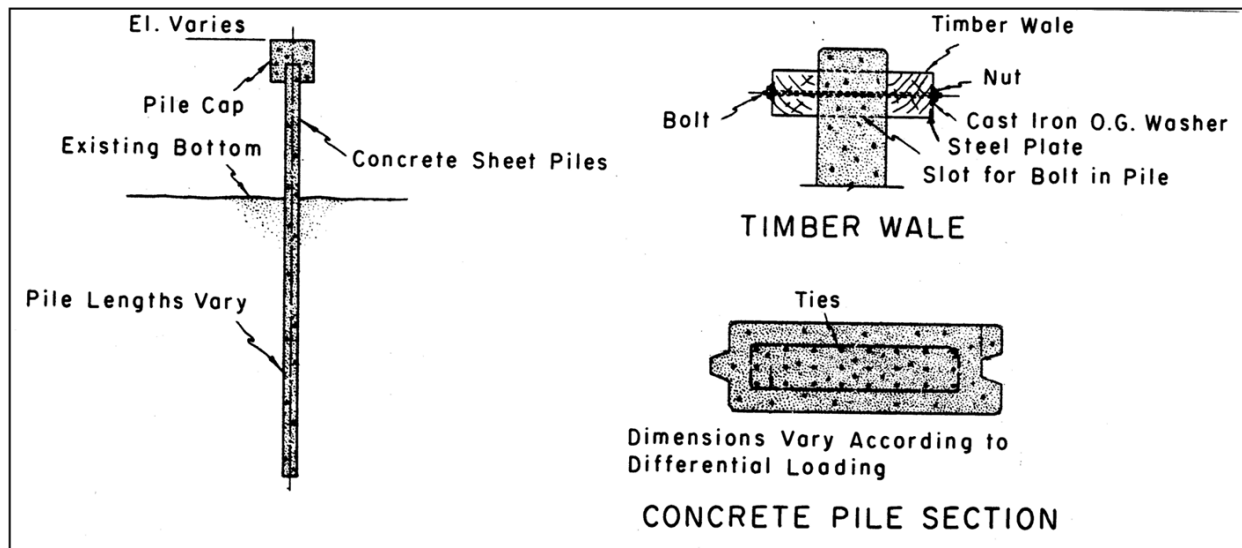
Pre-stressed concrete sheet-pile groin construction and materials.
